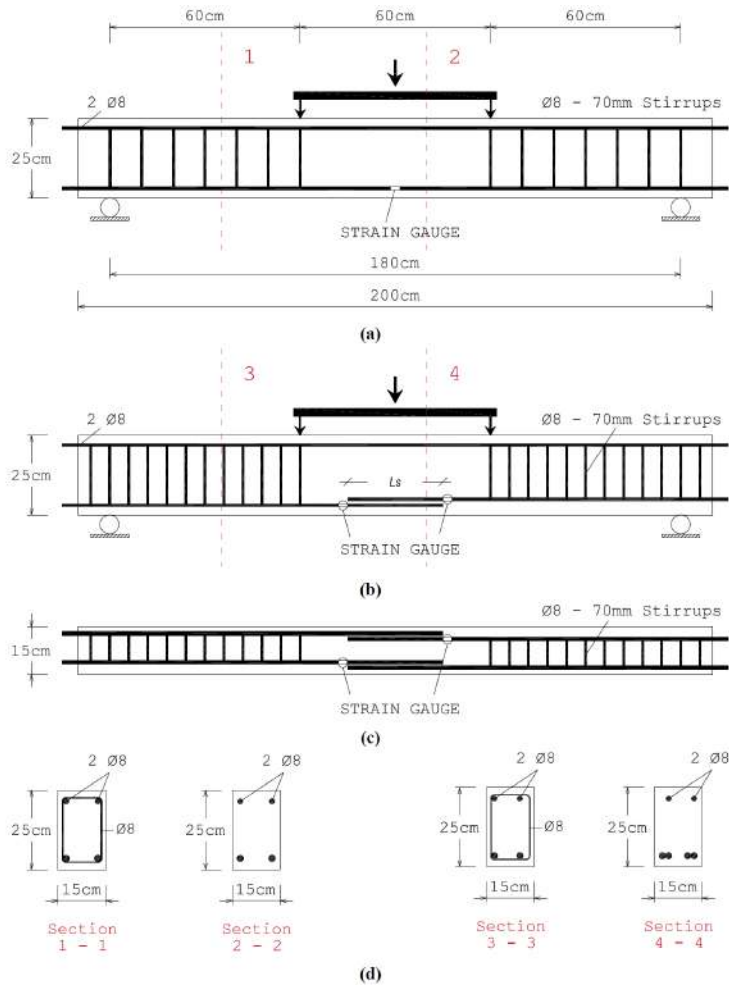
Beam details without transverse stirrups in the loading area (a) control beam, (b) splice beam, (c) bottom view of the splice beam, and (d) cross section.
